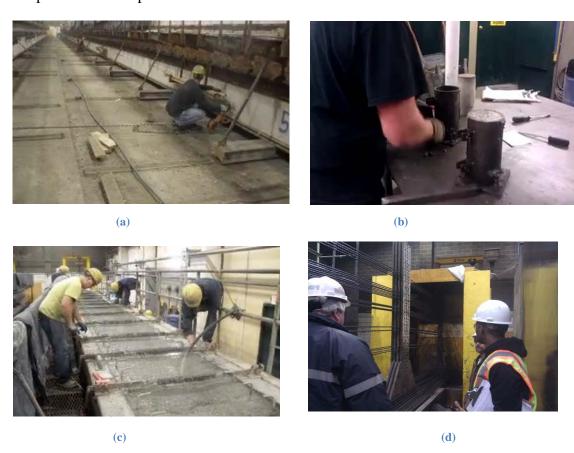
(a) Formwork, (b) Concrete test, (c) Concrete Pour, and (d) Strand Inspection at NPP
